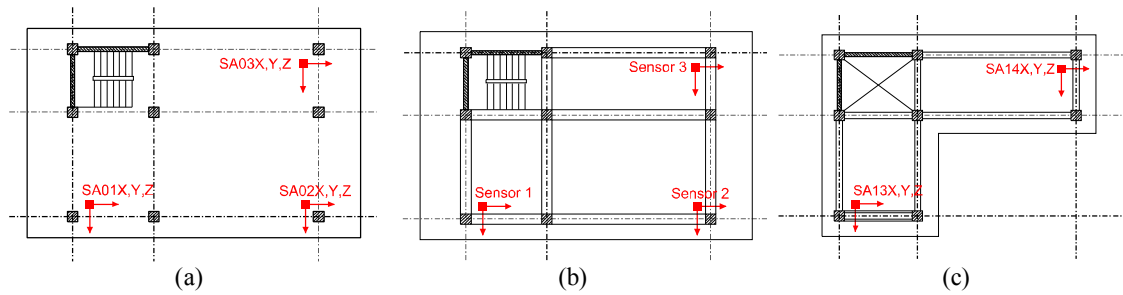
Schematic diagrams of the floor plans [5] showing locations of accelerometers used in the superstructure: (a) 1st floor; (b) typical floors; (c) roof
